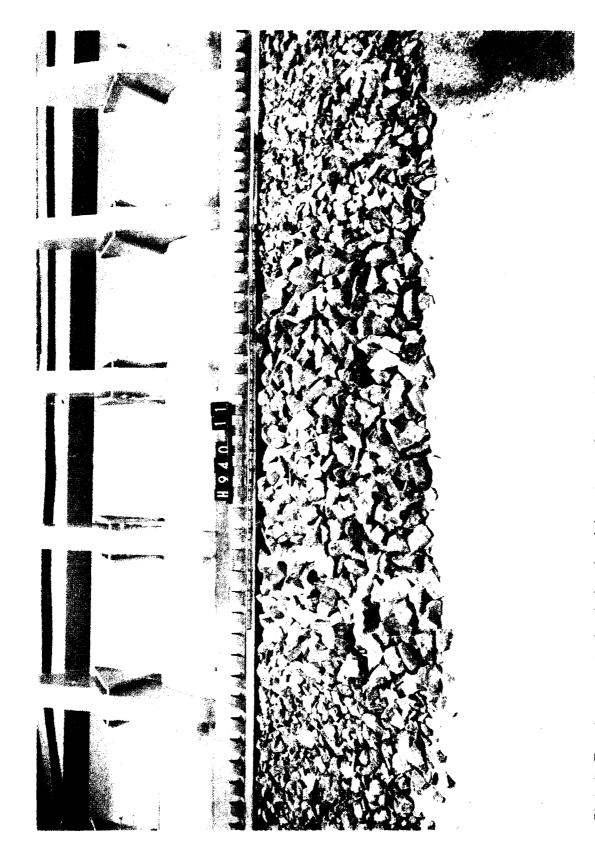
Type 2 scour protection design placed downstream of one gate bay
